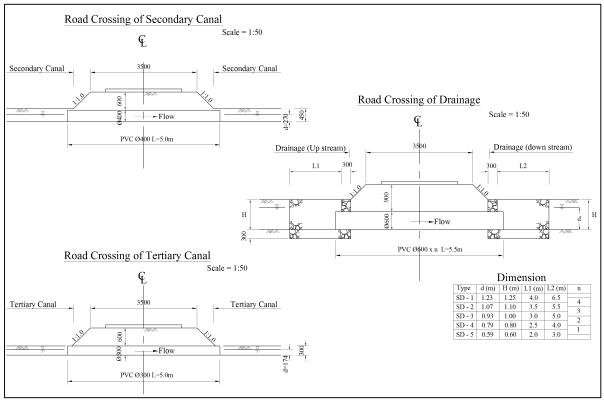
Typical Cross section of Road Crossing in Command Area
